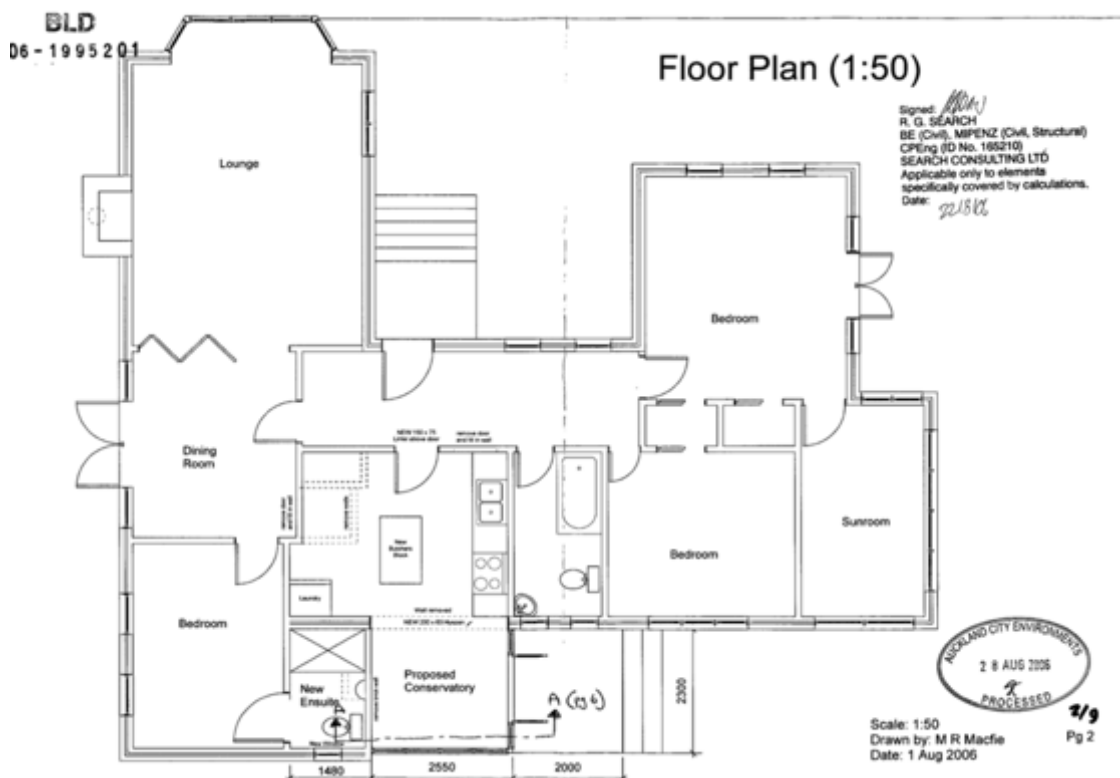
Floor plan of the former Butler House in 2006, when the conservatory was proposed (Auckland Council property records).
